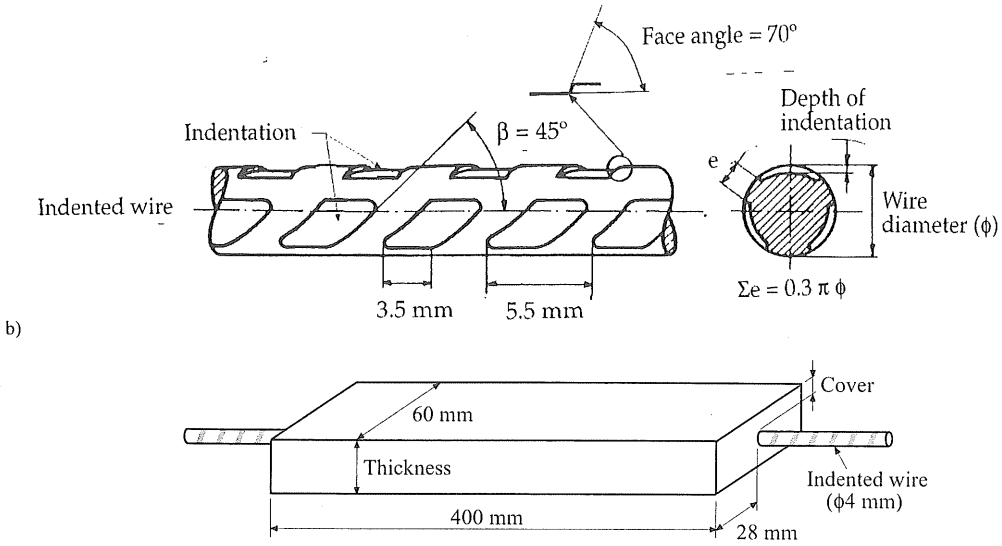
Geometry and dimensions of the: a) indented wire, and b) specimens
